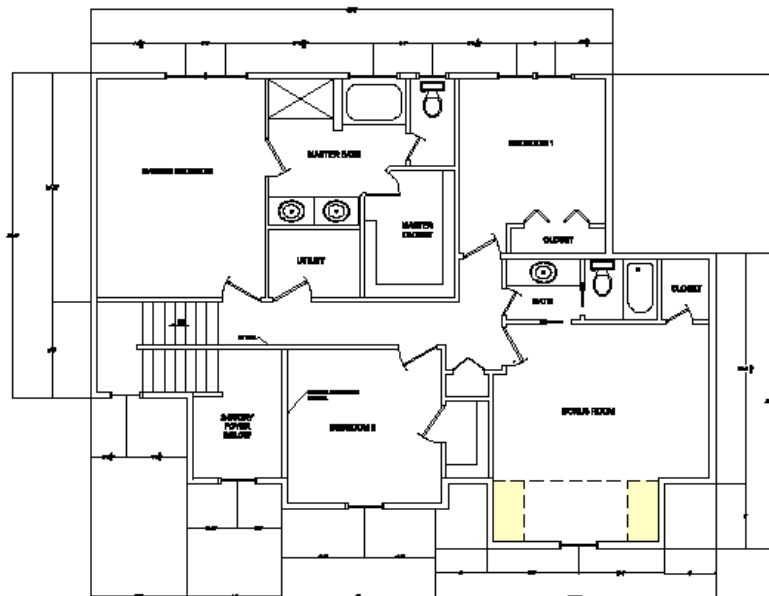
Second floor of CC3. Shaded areas are well-insulated knee walls to reduce the thermal convection from the unconditioned garage space.
